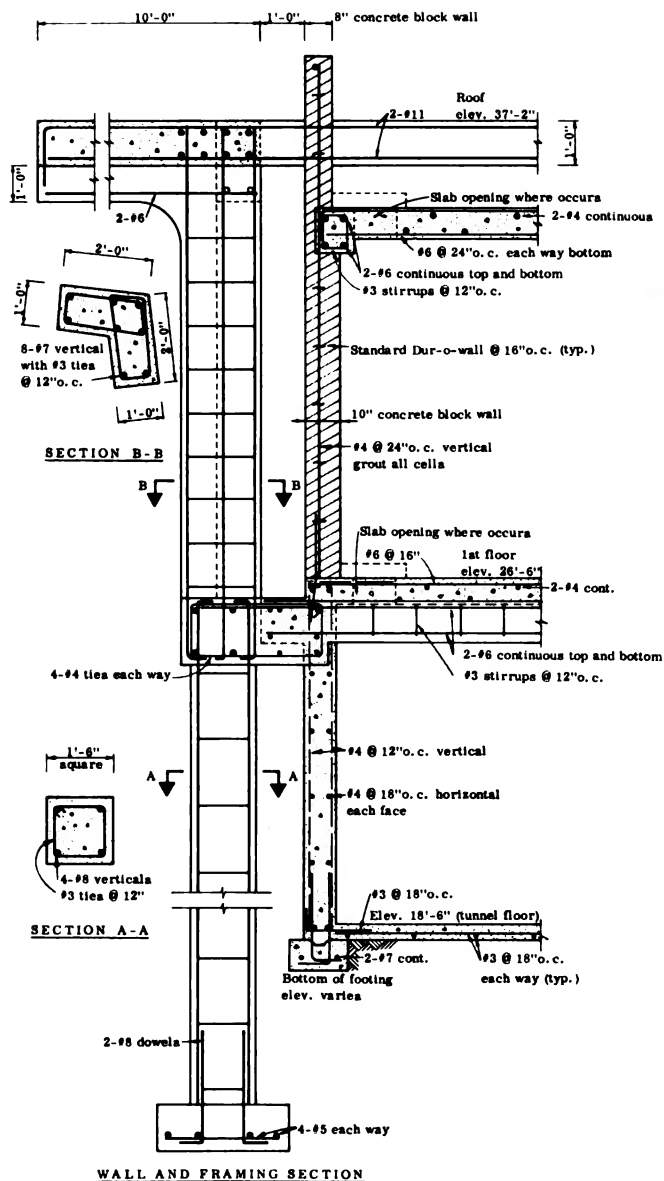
Olive View Hospital, exhaust building. Section details through building wall and framing.
